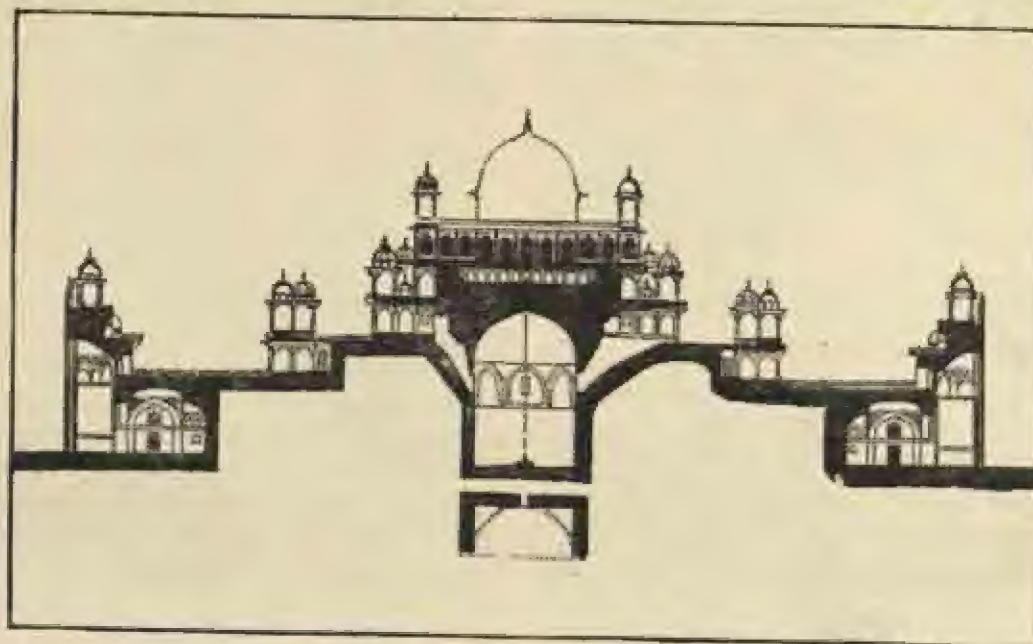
Elevation of Akbar's tomb at Sikandara with conjectural dome.
